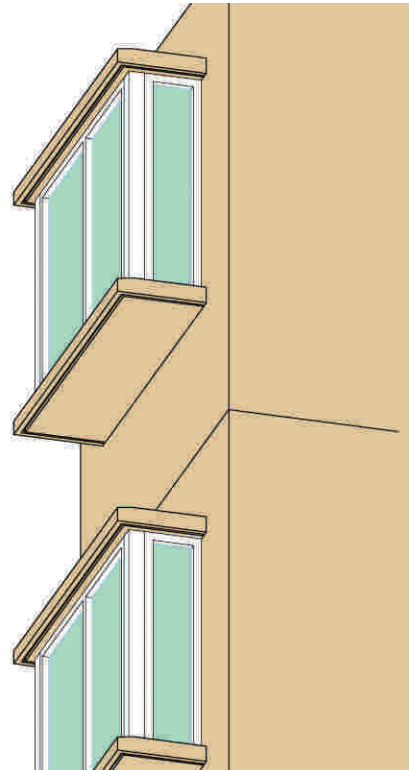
Drip grooves on bay window façade to control weathering
